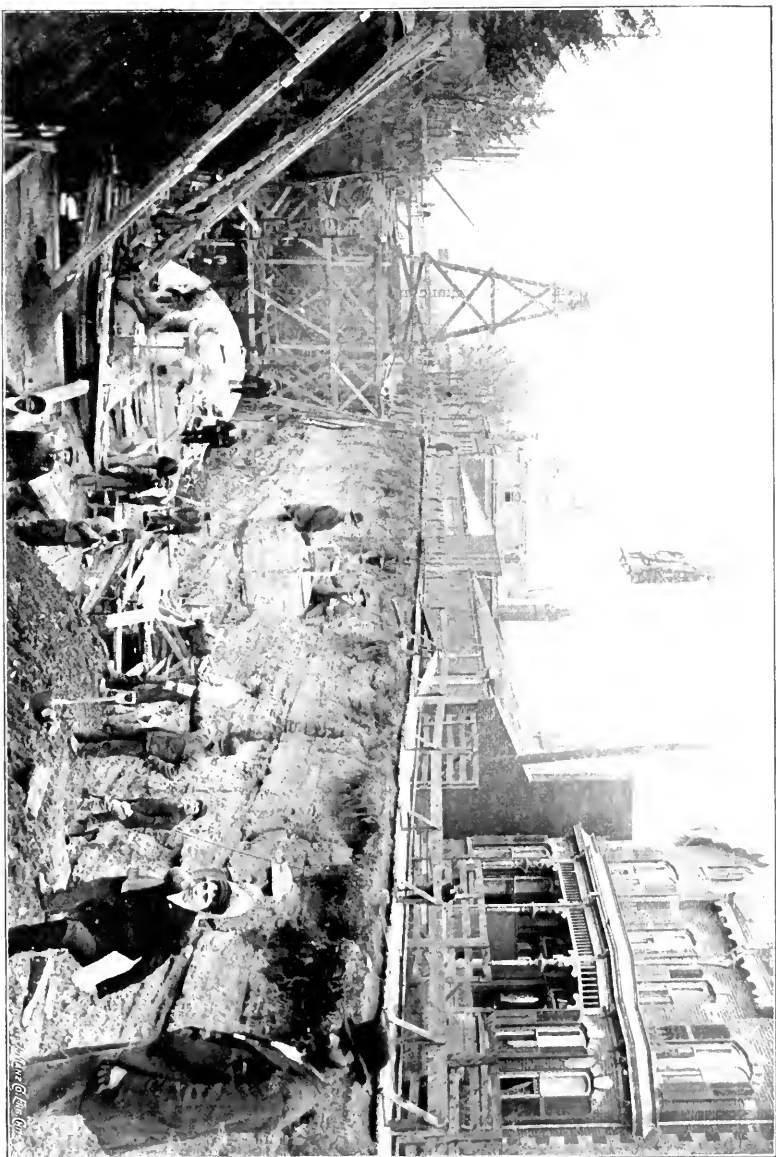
TRAVELING CARRIAGE, TAIL TOWER, CARRIAGE AND HOCKETT.
